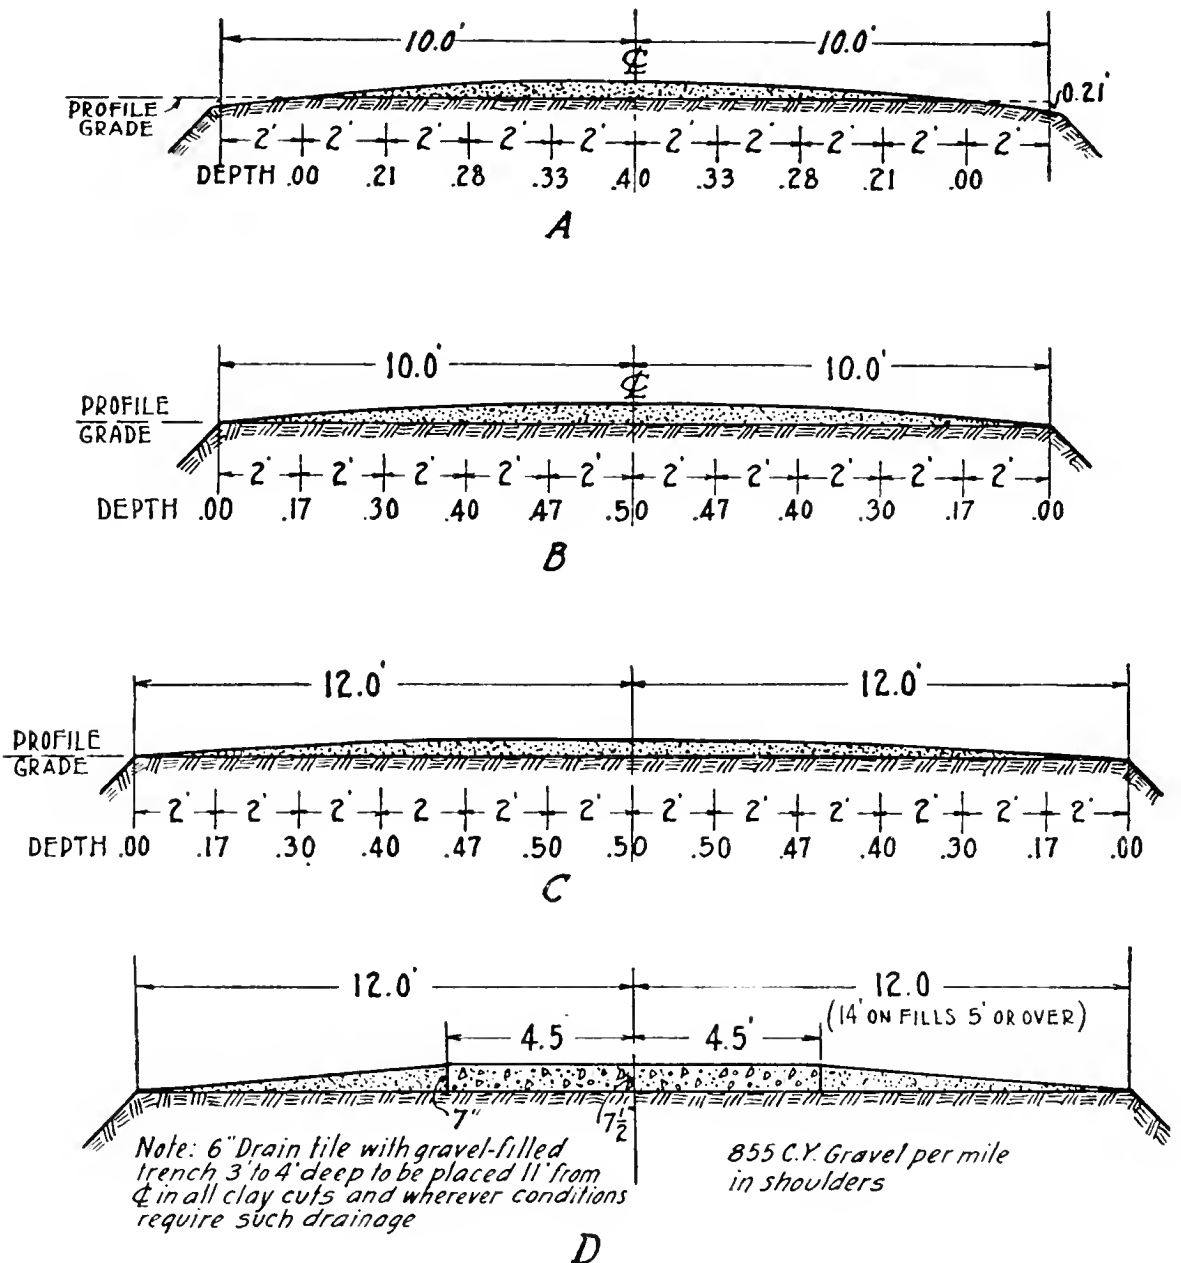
Standard surfacing sections of the Minnesota Highway Department for secondary trunk or primary state roads
